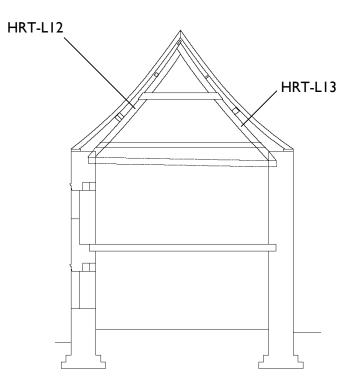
Truss 10 (west face), showing the location of samples HRT-L12 and HRT-L13 (Morton & Hall Consulting Ltd)
